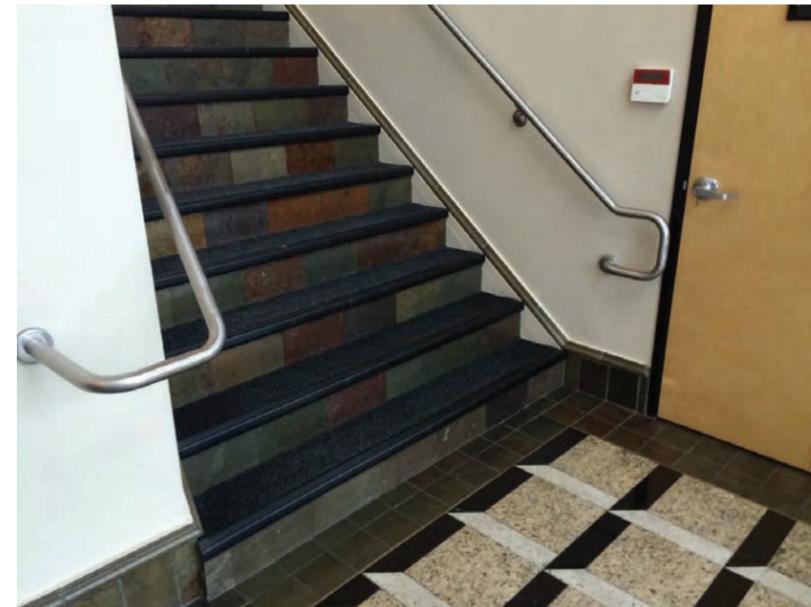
Stairs are steeper than code required, exceeding 7 inches at risers
